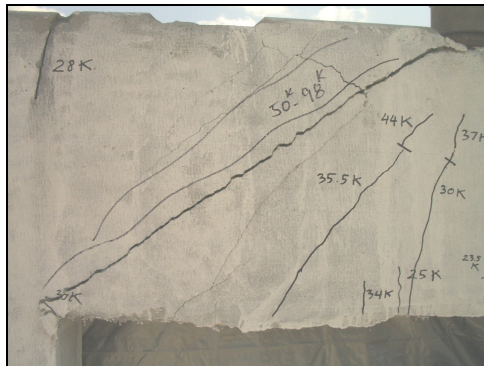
Big crack 45 degree at the corner of the opening occur at failure load 98 kips
